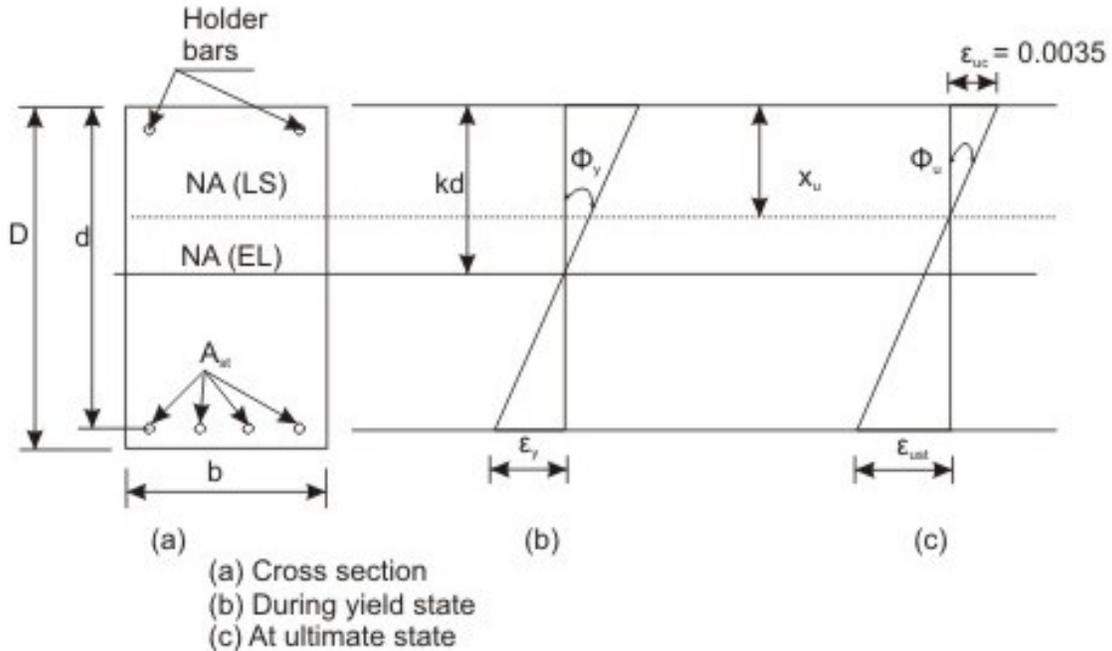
Rectangular cross-section of a singly-reinforced beam
